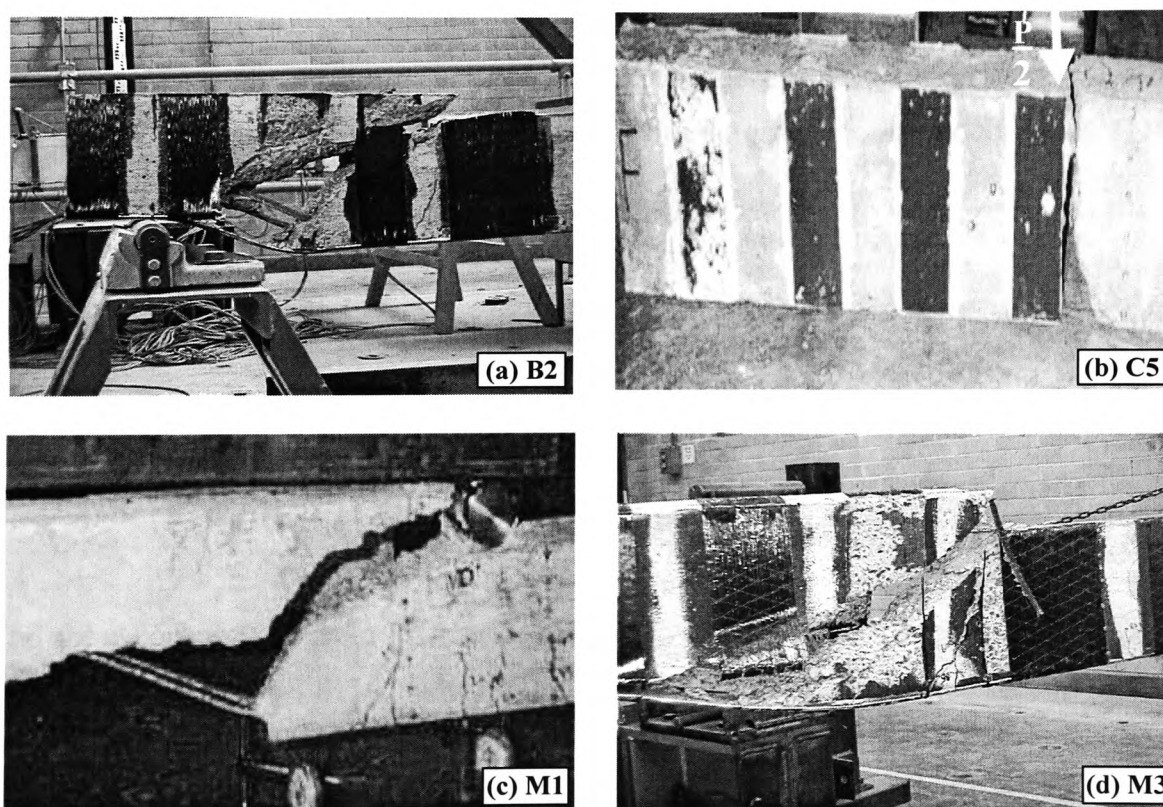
Typical Shear Failure Mode of Simple and Continuous Beams
